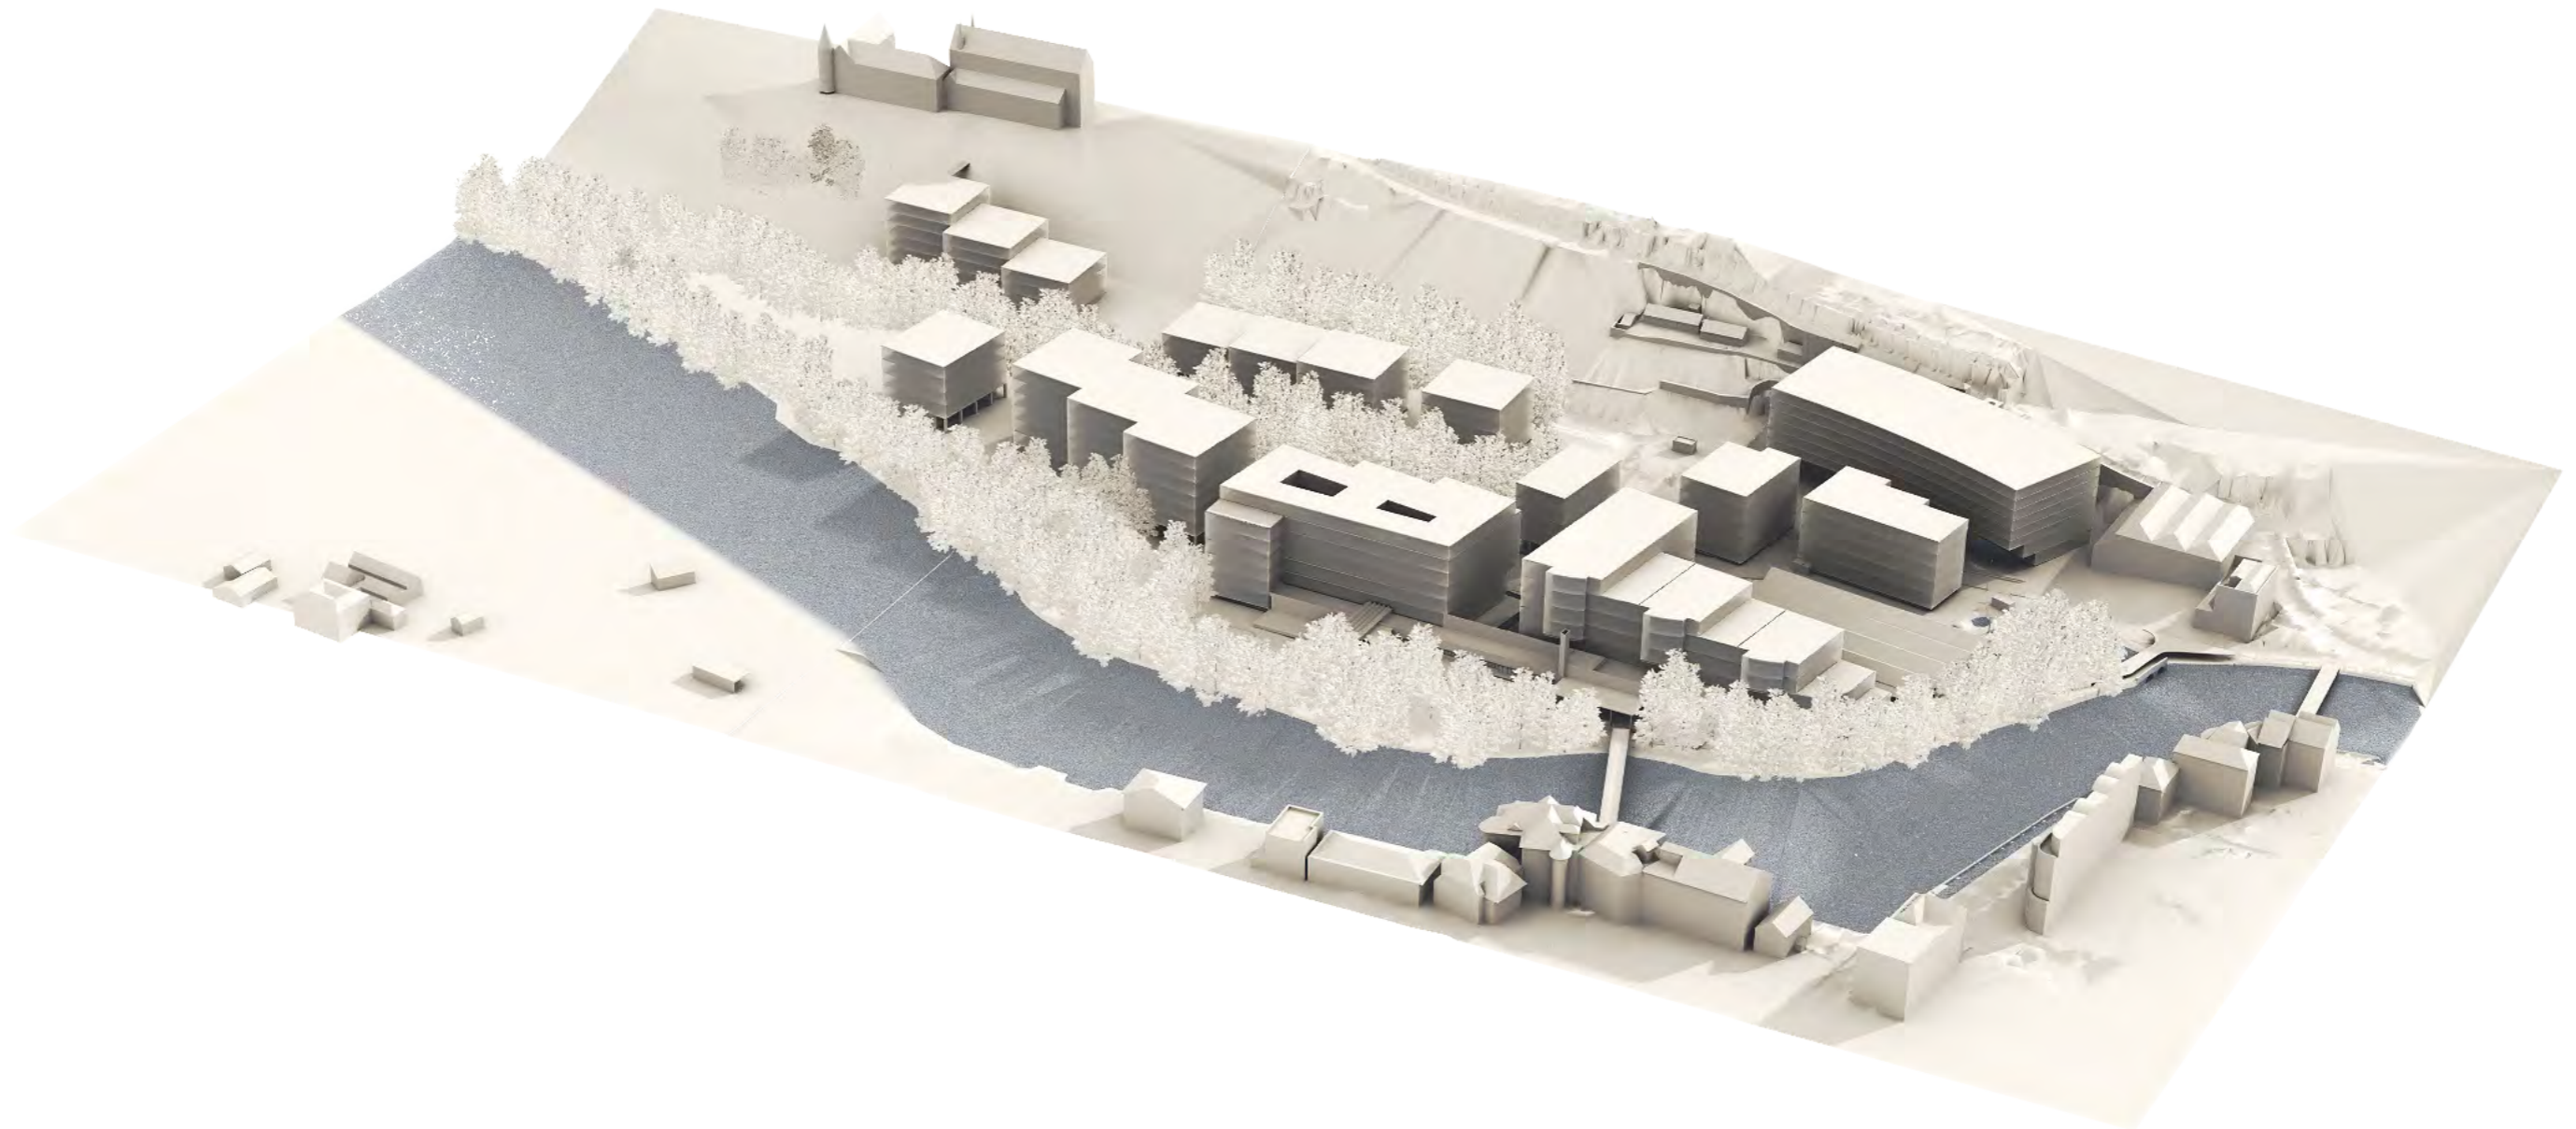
The North Mall Campus Proposed Masterplan in Quantum
